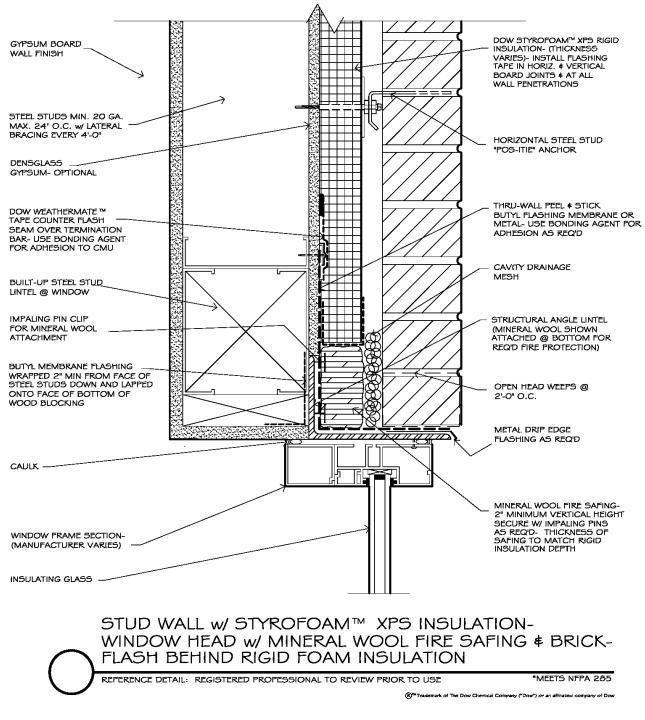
Window / Door Header Detail with FR Wood Blocking
